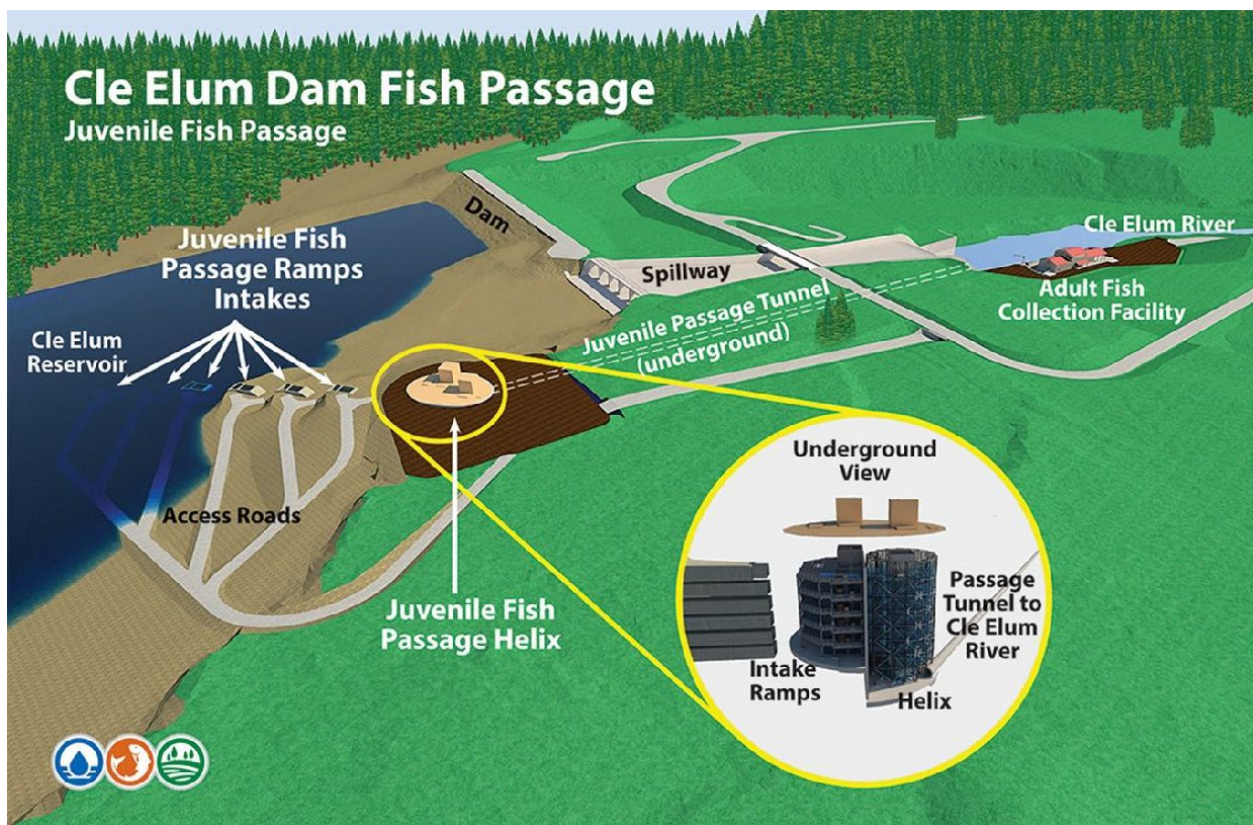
Illustration of facilities to be constructed for the Cle Elum Dam Fish Passage Facilities Project. (Reclamation 2020, their Figure 1).
